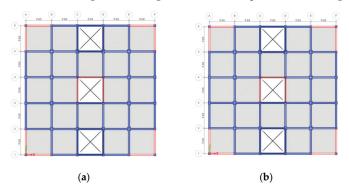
(a) G + 15 shear wall with opening Floor Plan; (b) G + 15 shear wall without opening Floor Plan.
